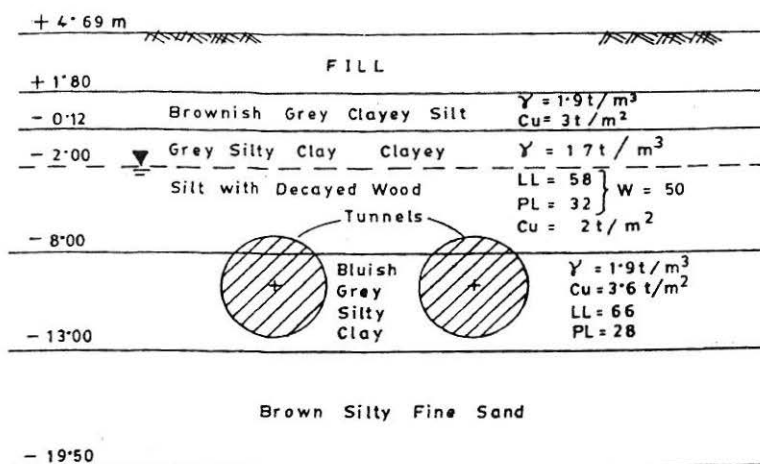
Shield Tunnelling between Belgachia and Shyambazar
